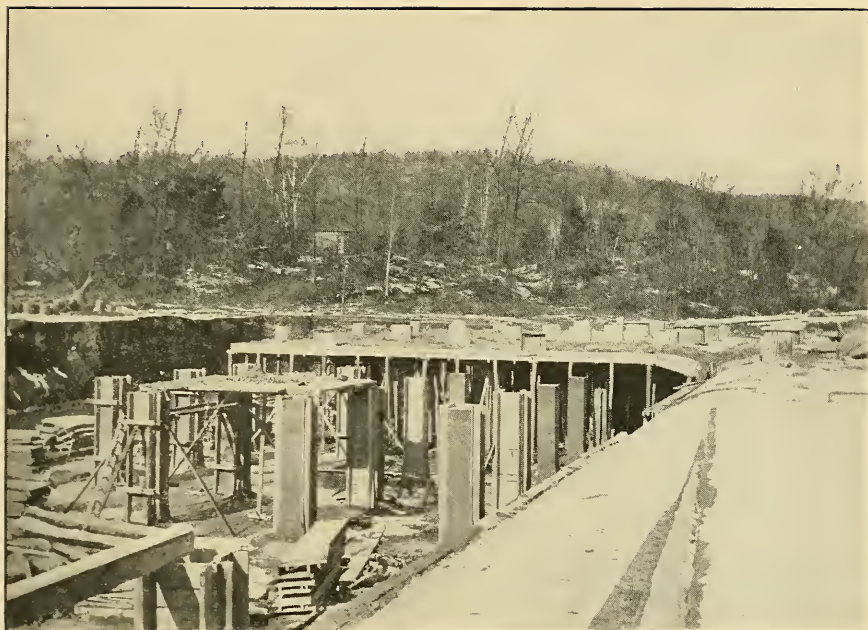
METHOD OF PLACING FILTER PIER CONCRETE.
